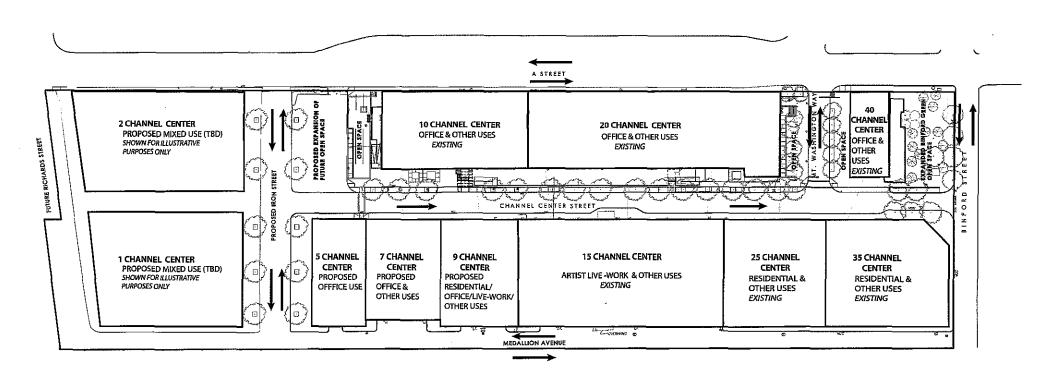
SITE PLAN – EXISTING DEVELOPMENT (See attached)
